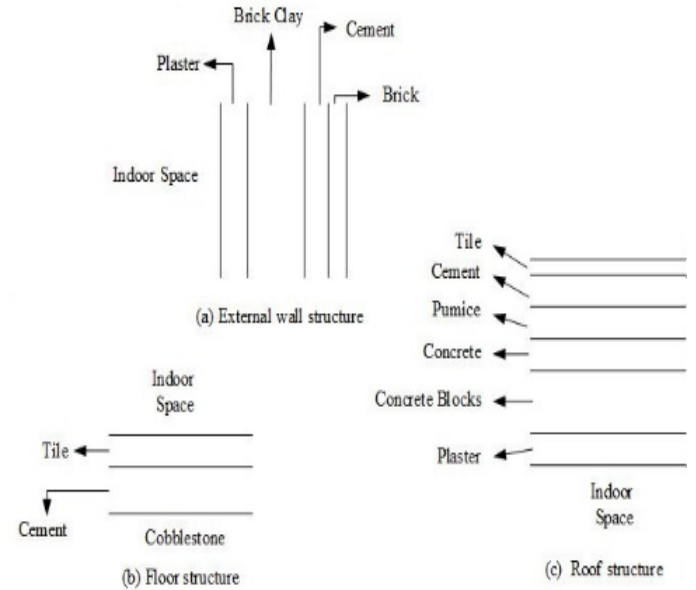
HWB external walls, floor, and roof structures layout: (a) External wall structure, (b) Floor structure, (c) Roof structure.
